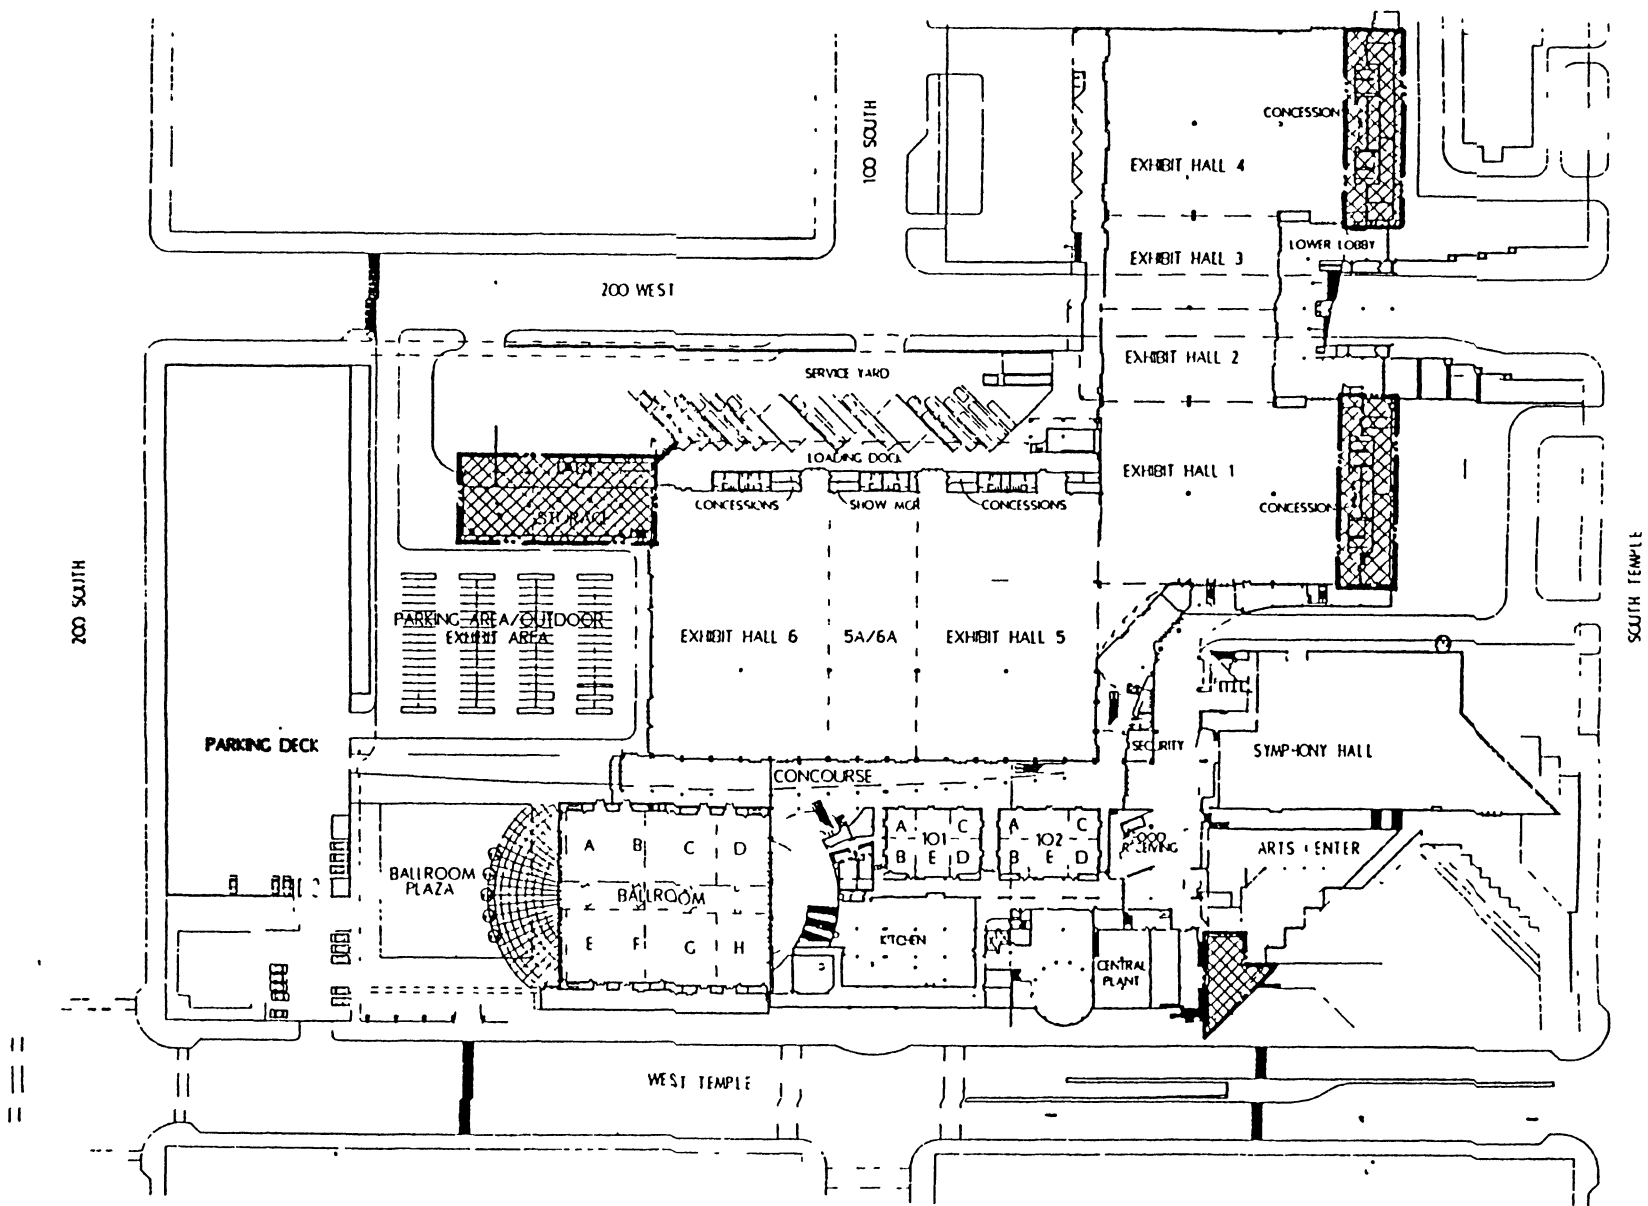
/F1 FLOOR PLAN (LOWER LEVEL)
